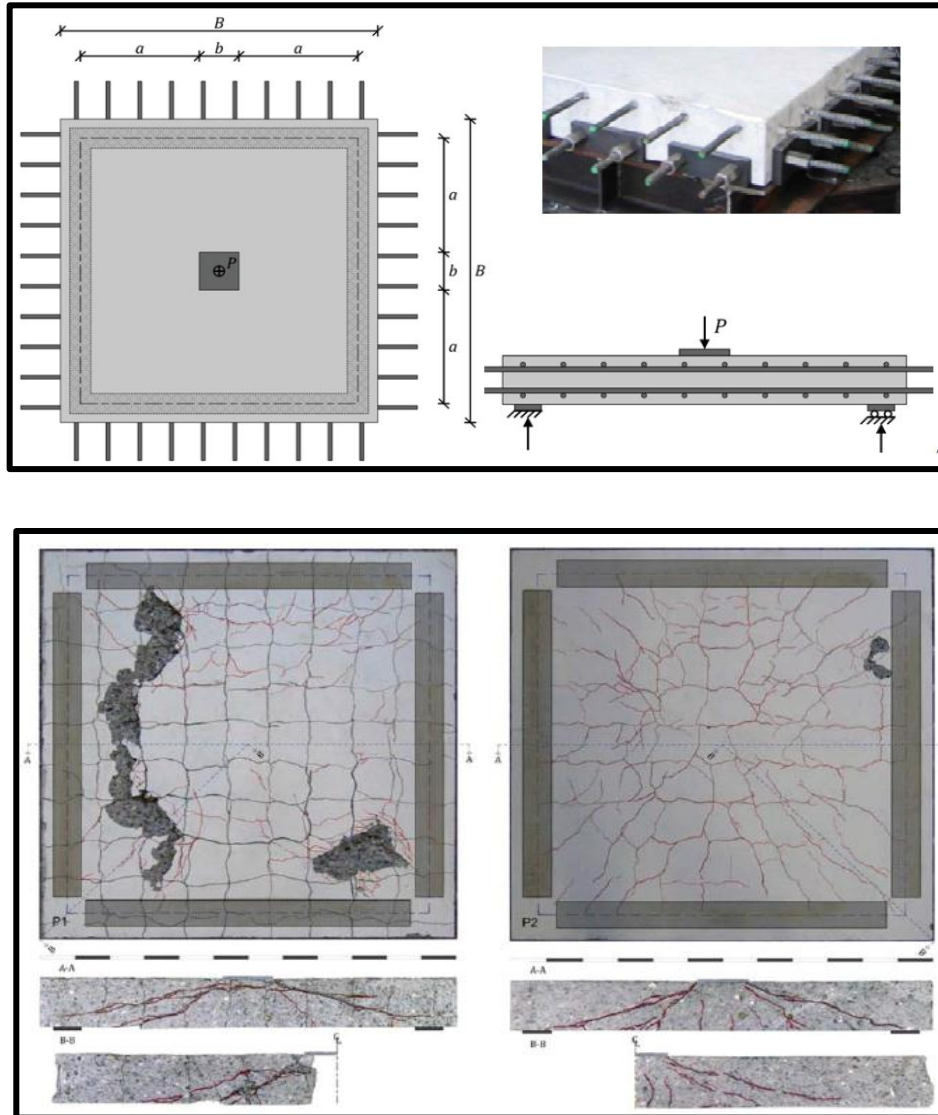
Failure shape and crack pattern of RC slabs (Hoang ,2011).
